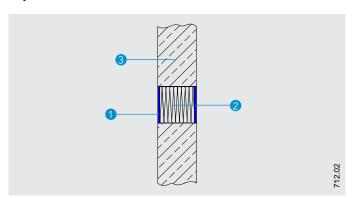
Detail B - Vertical or horizontal joint filling coated on the unexposed side in wall
